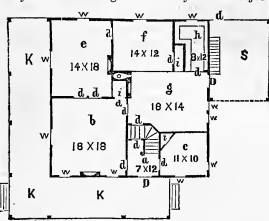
PLAN OF MAIN OR GROUND FLOOR.
